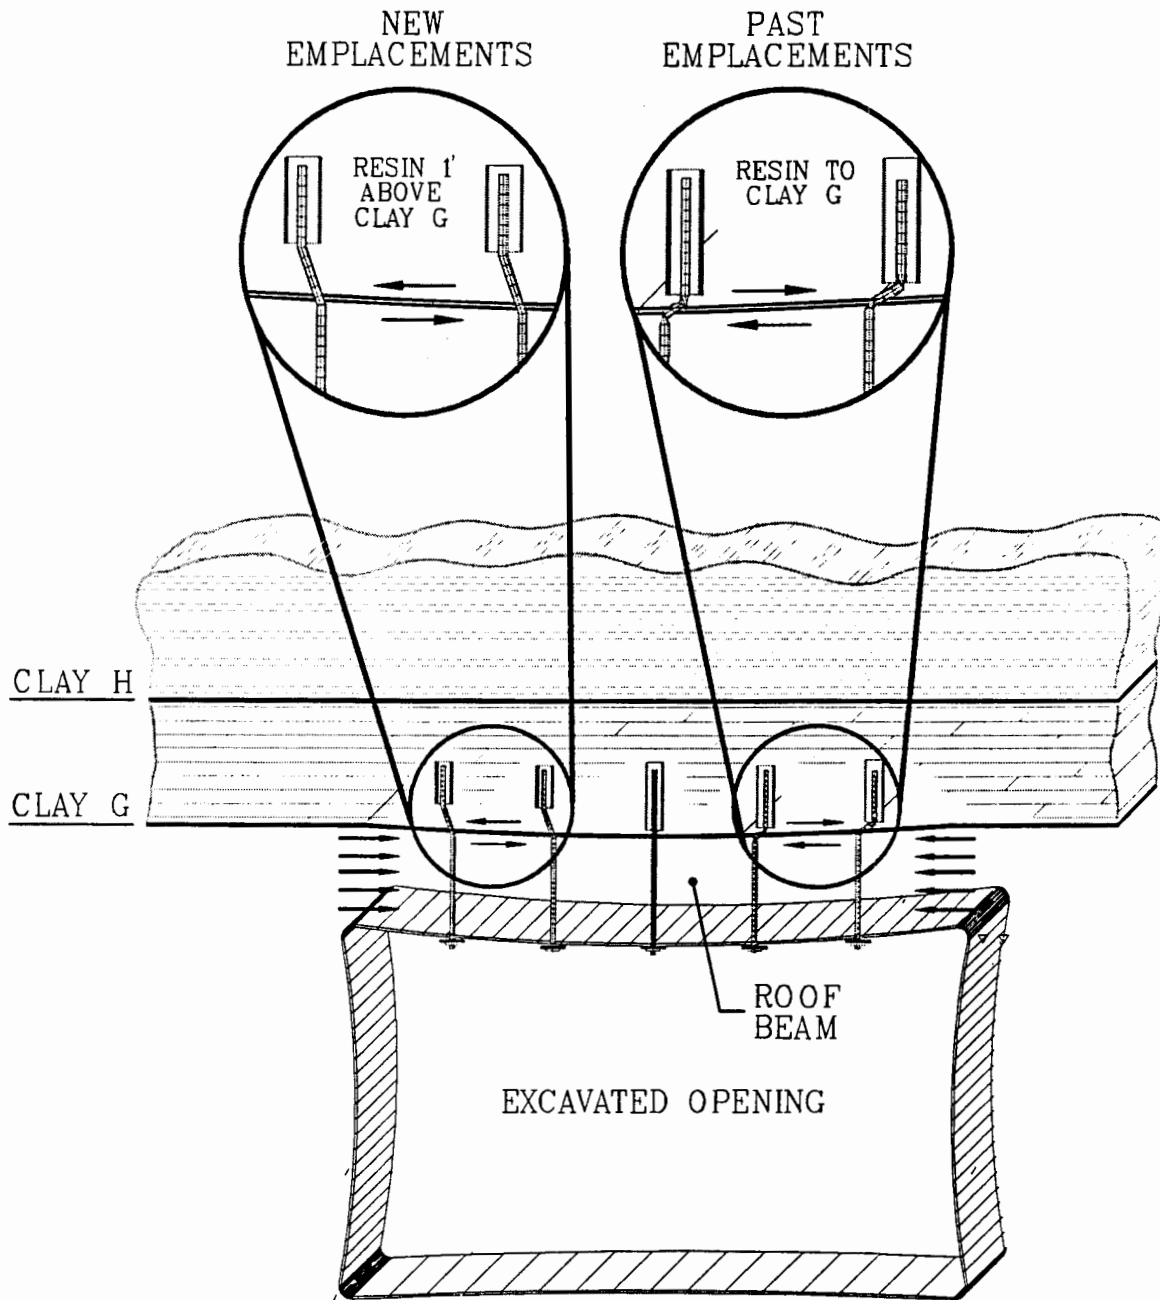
Roof Beam Offsetting and Related Bolt Loading
